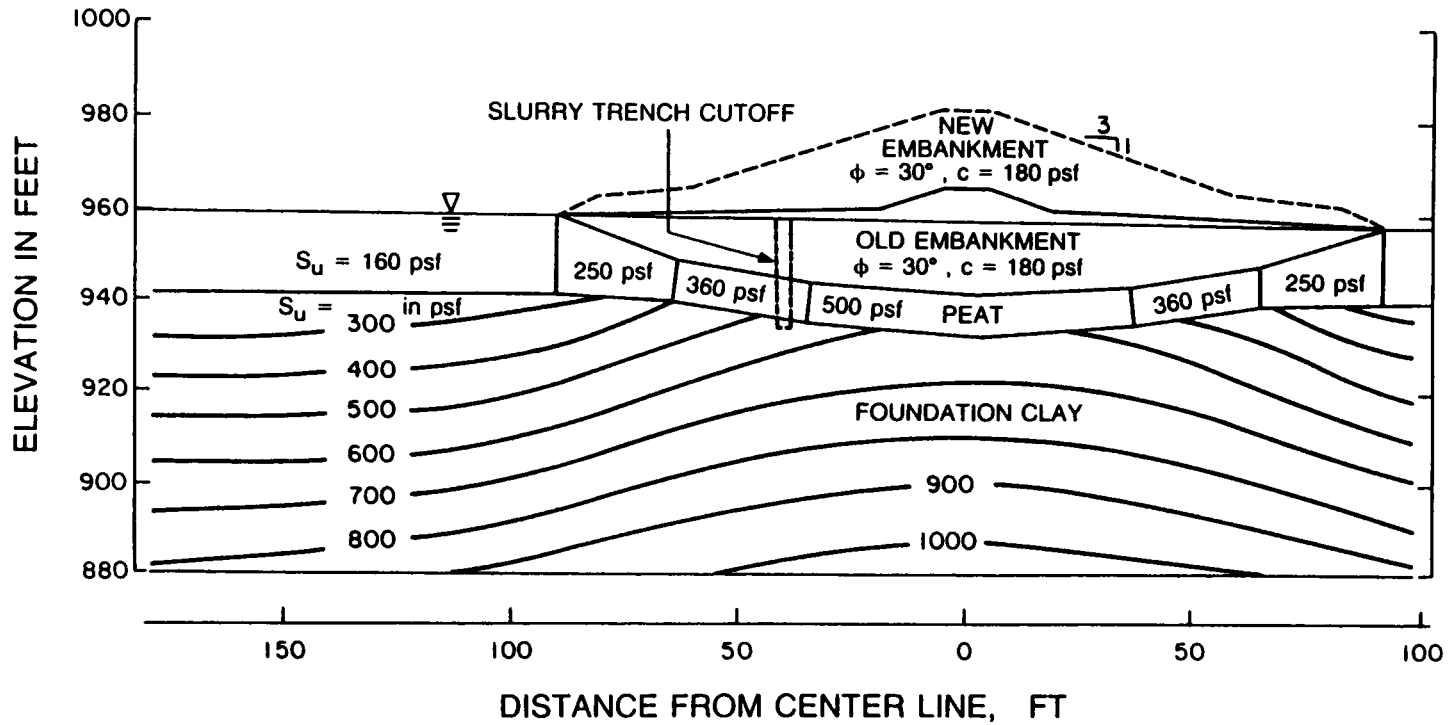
Typical cross-section of Mohicanville Dike No. 2 showing foundation conditions, old and new embankment limits and undrained shear strengths (after Collins et al. 1982).
